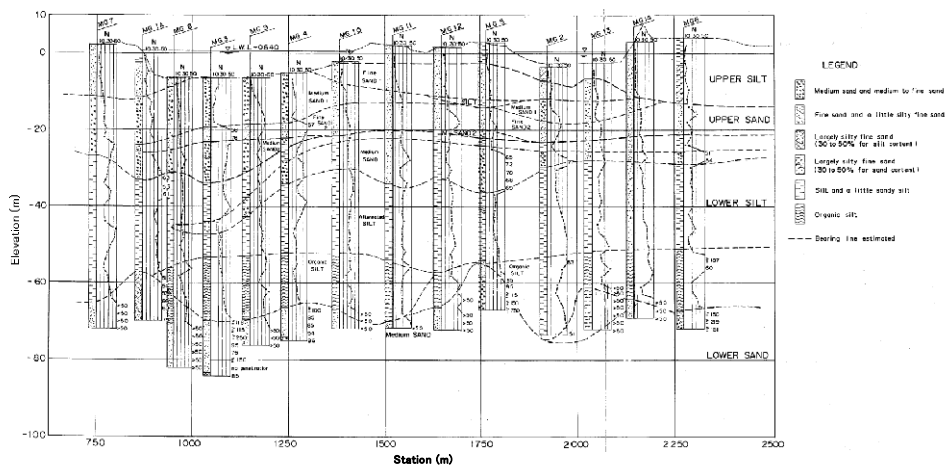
Geological Profile at Existing Gumti Bridge Site
